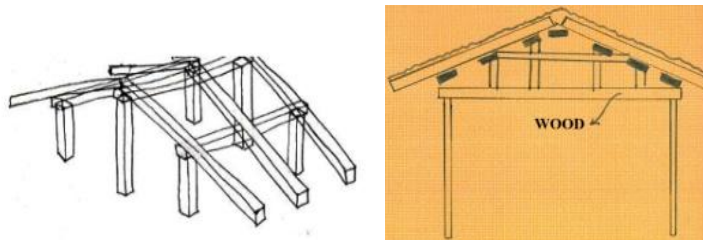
Roof.Detail, Gilan Cultural Heritage.
